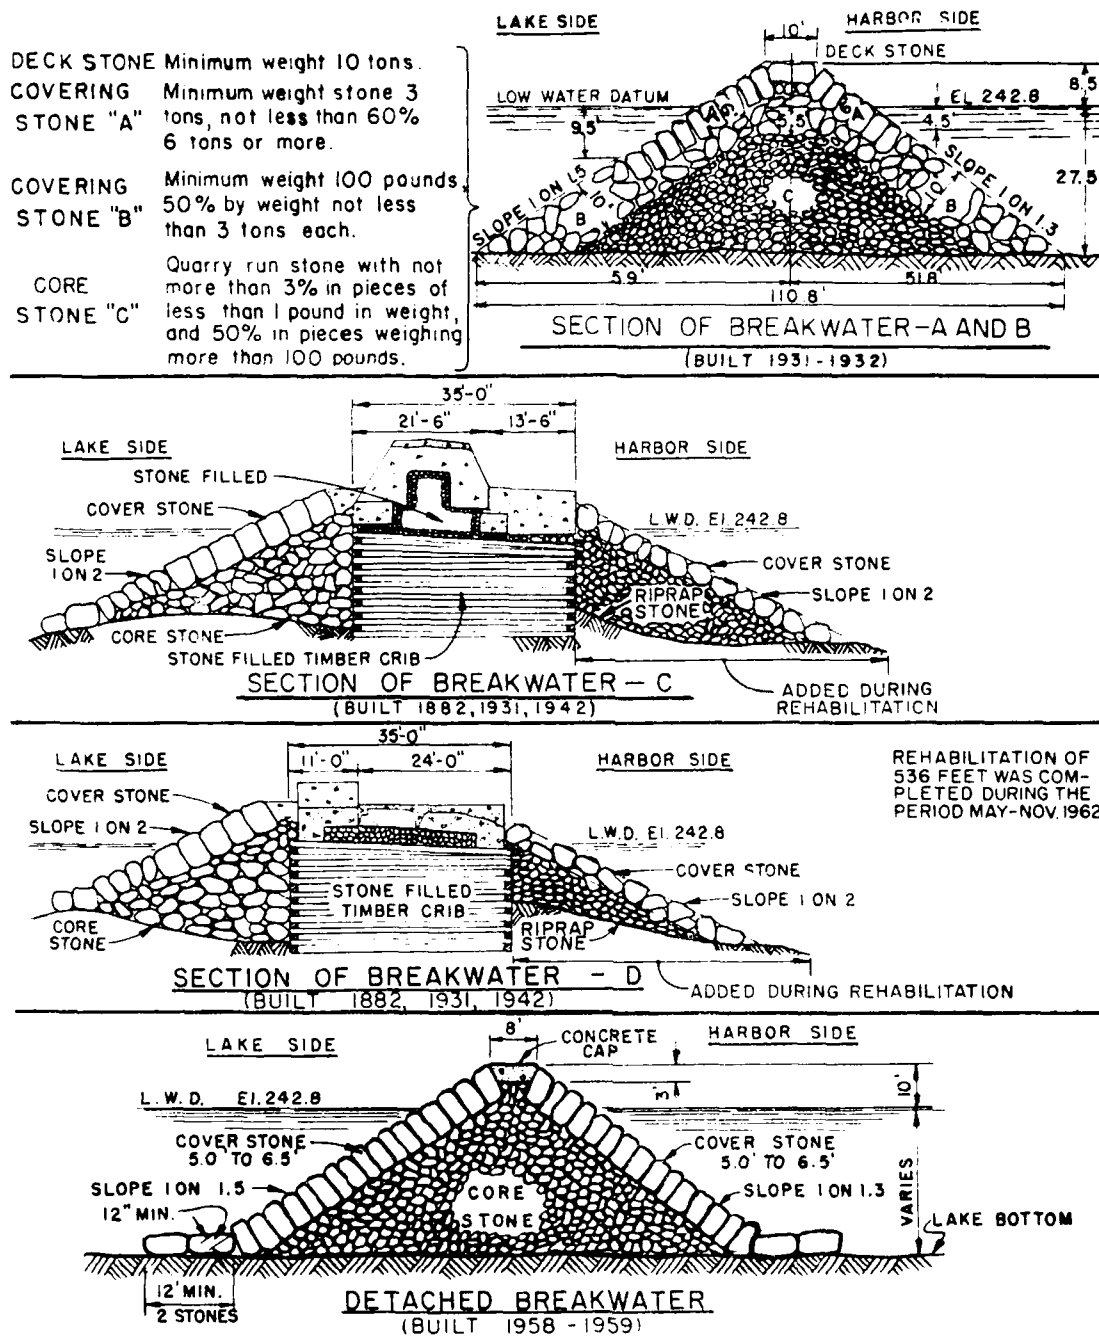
Typical breakwater cross sections, Oswego Harbor, New York
